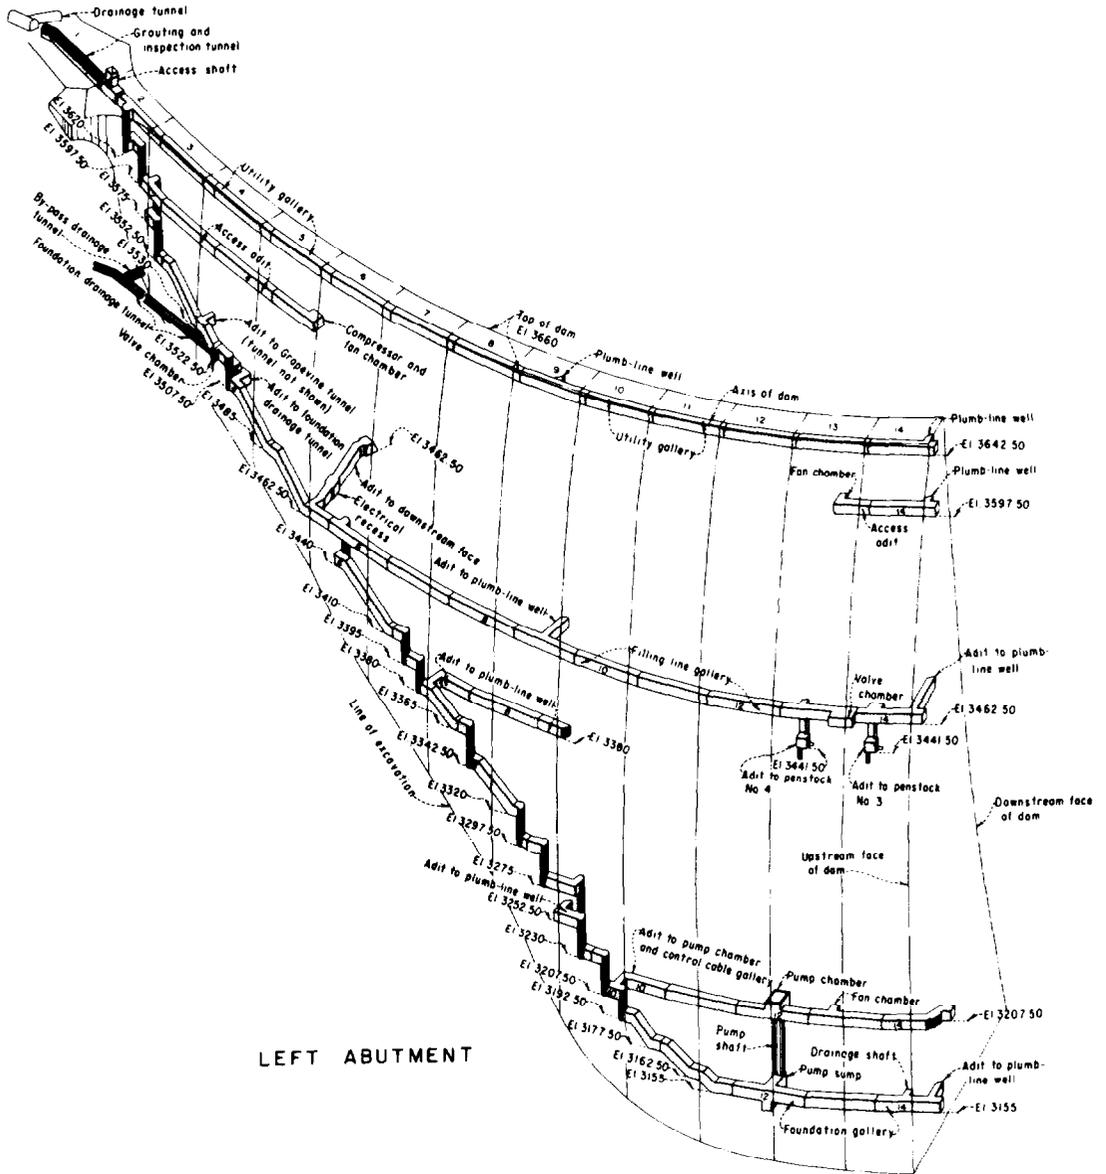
Gallery system in Yellowtail Dam—left abutment. 288-D-3076
